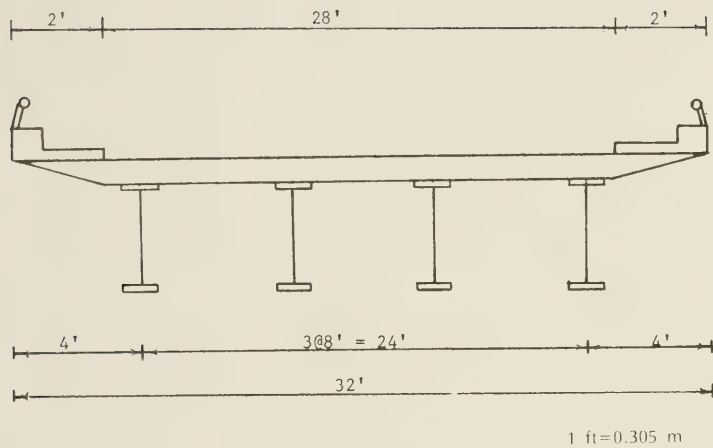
Bridge cross section with 2.4 m (8 ft) stringer spacing.
